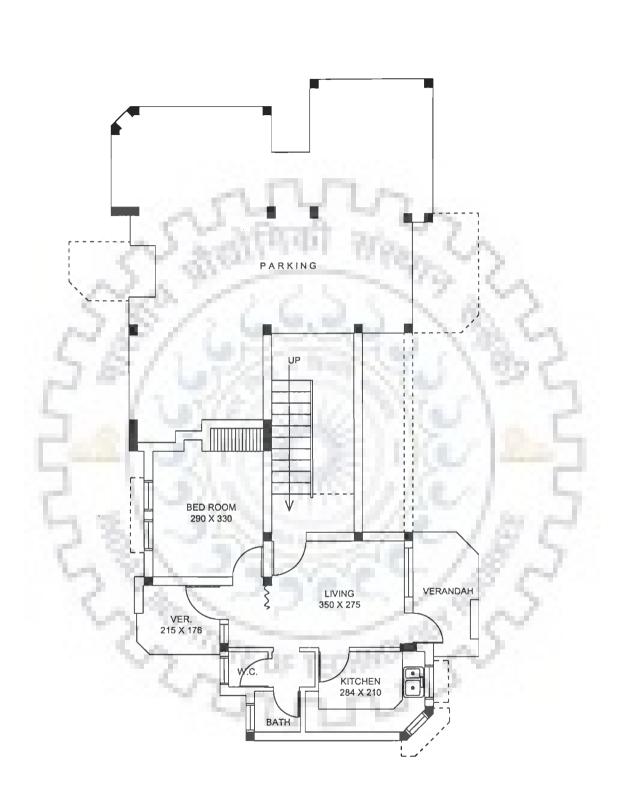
(d) - Typical Floor Plan of Type B-B, Project No. 14
